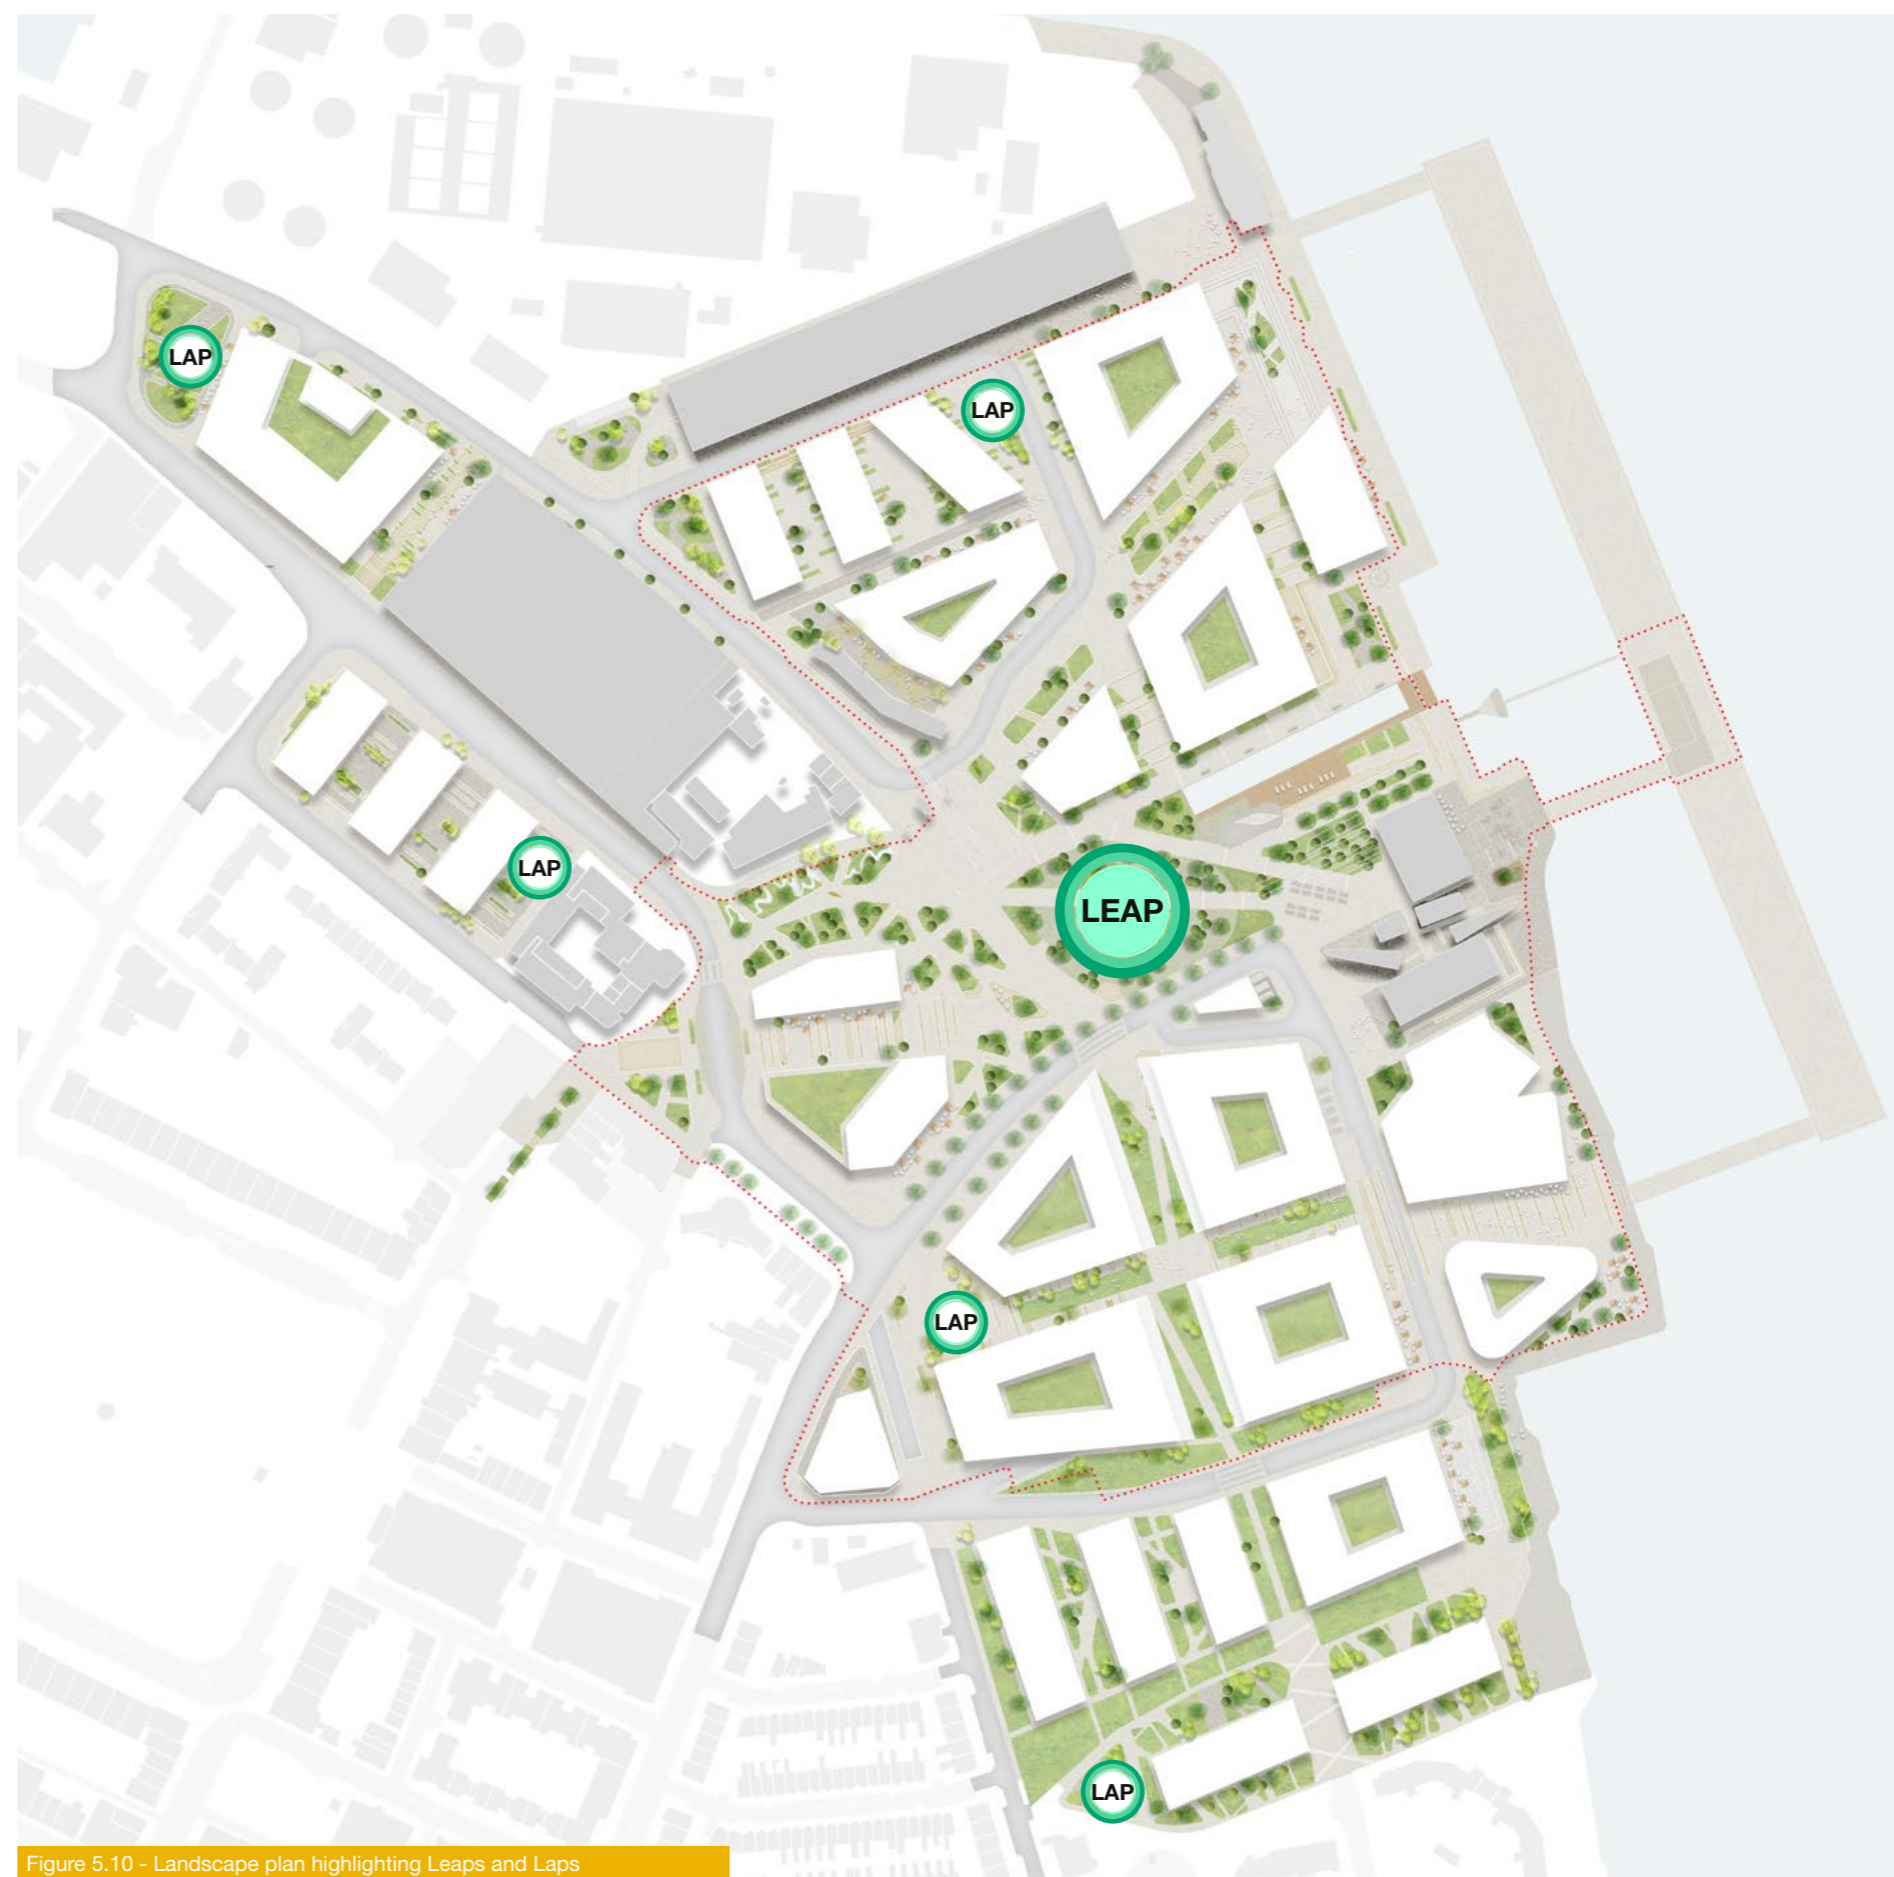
Landscape plan highlighting Leaps and Laps
